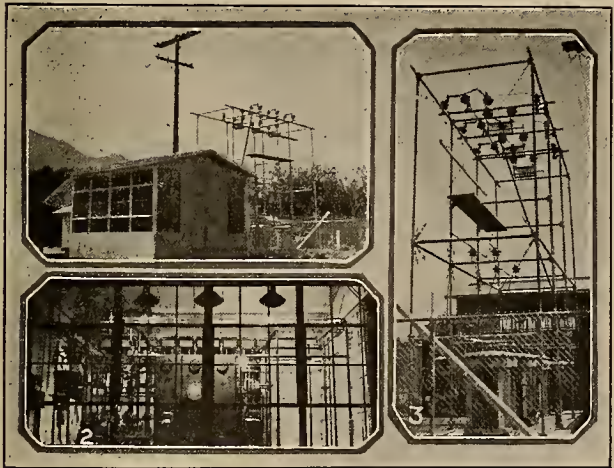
(1) Showing station building, transformer rack, and two outgoing 2.3-kv. circuits. (2) Night view through windows of station. (3) Close-up of transformer rack.
